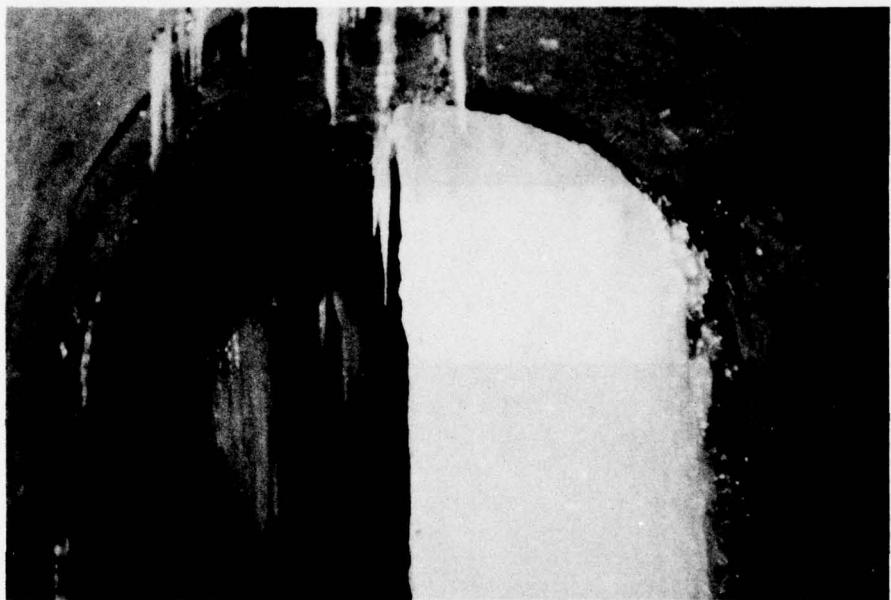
Typical view of construction joint leakage in landwall filling and emptying culverts as portrayed by ice sheets.
